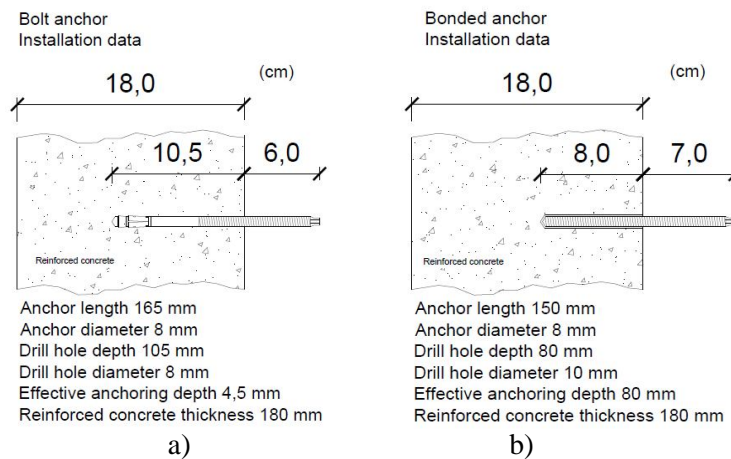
Installation of a: a) bolt anchor and b) bond anchor in reinforced concrete specimen.
